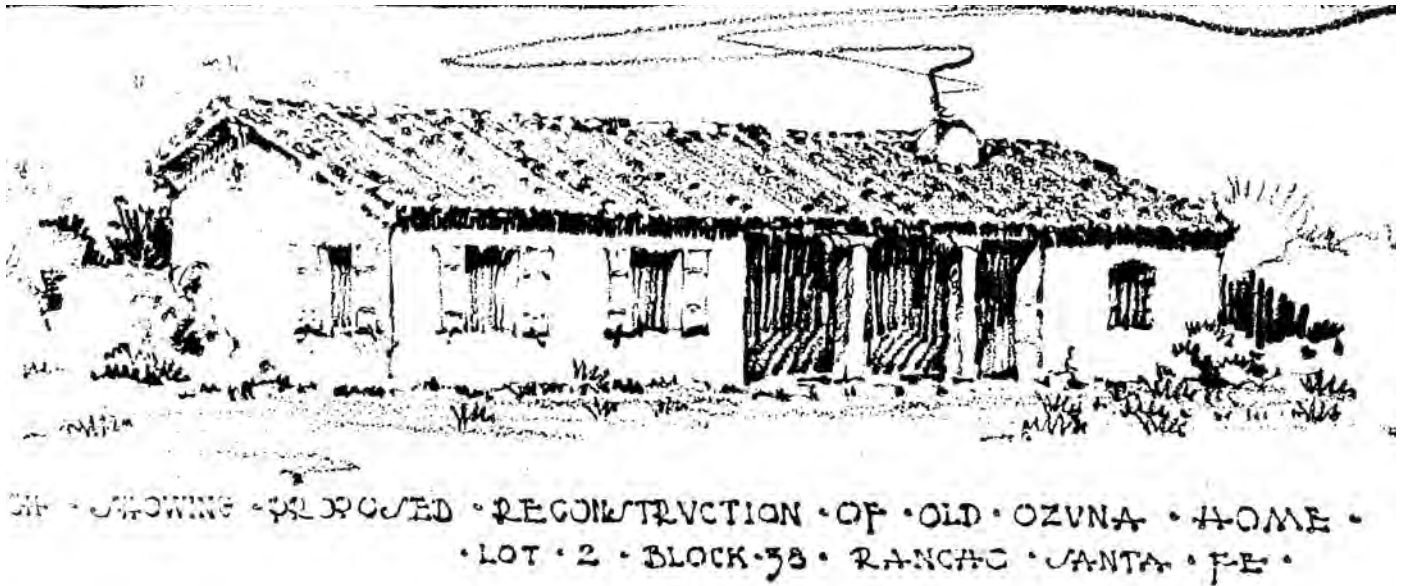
Front Elevation, Lilian J. Rice Rehabilitation rendering, Santa Fe Land Improvement Company
